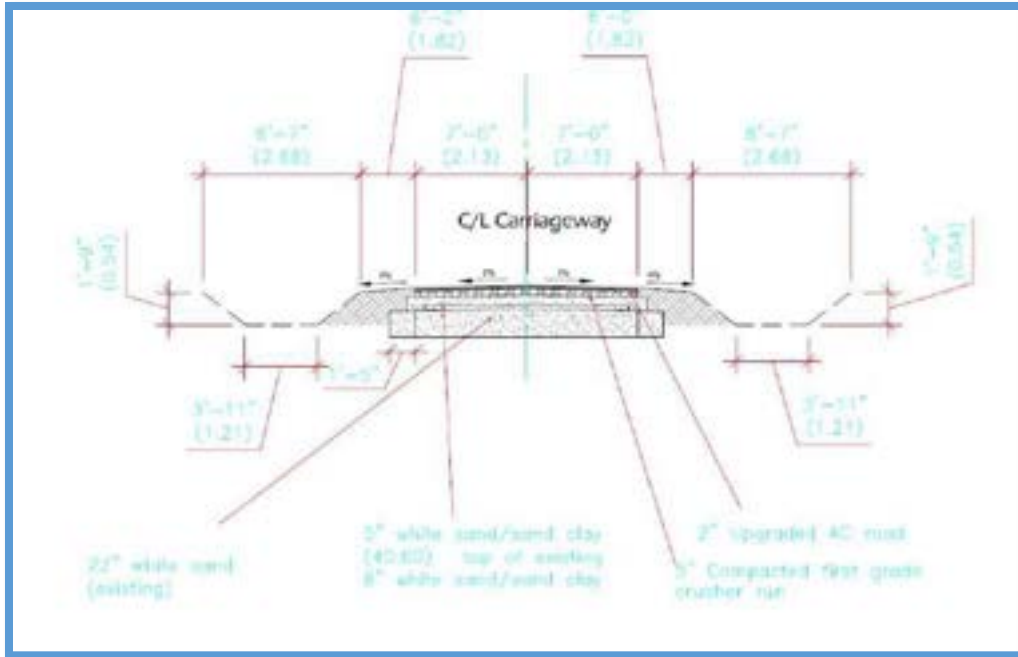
Cross Section of an Asphaltic Concrete on Crusher Run Link Road
